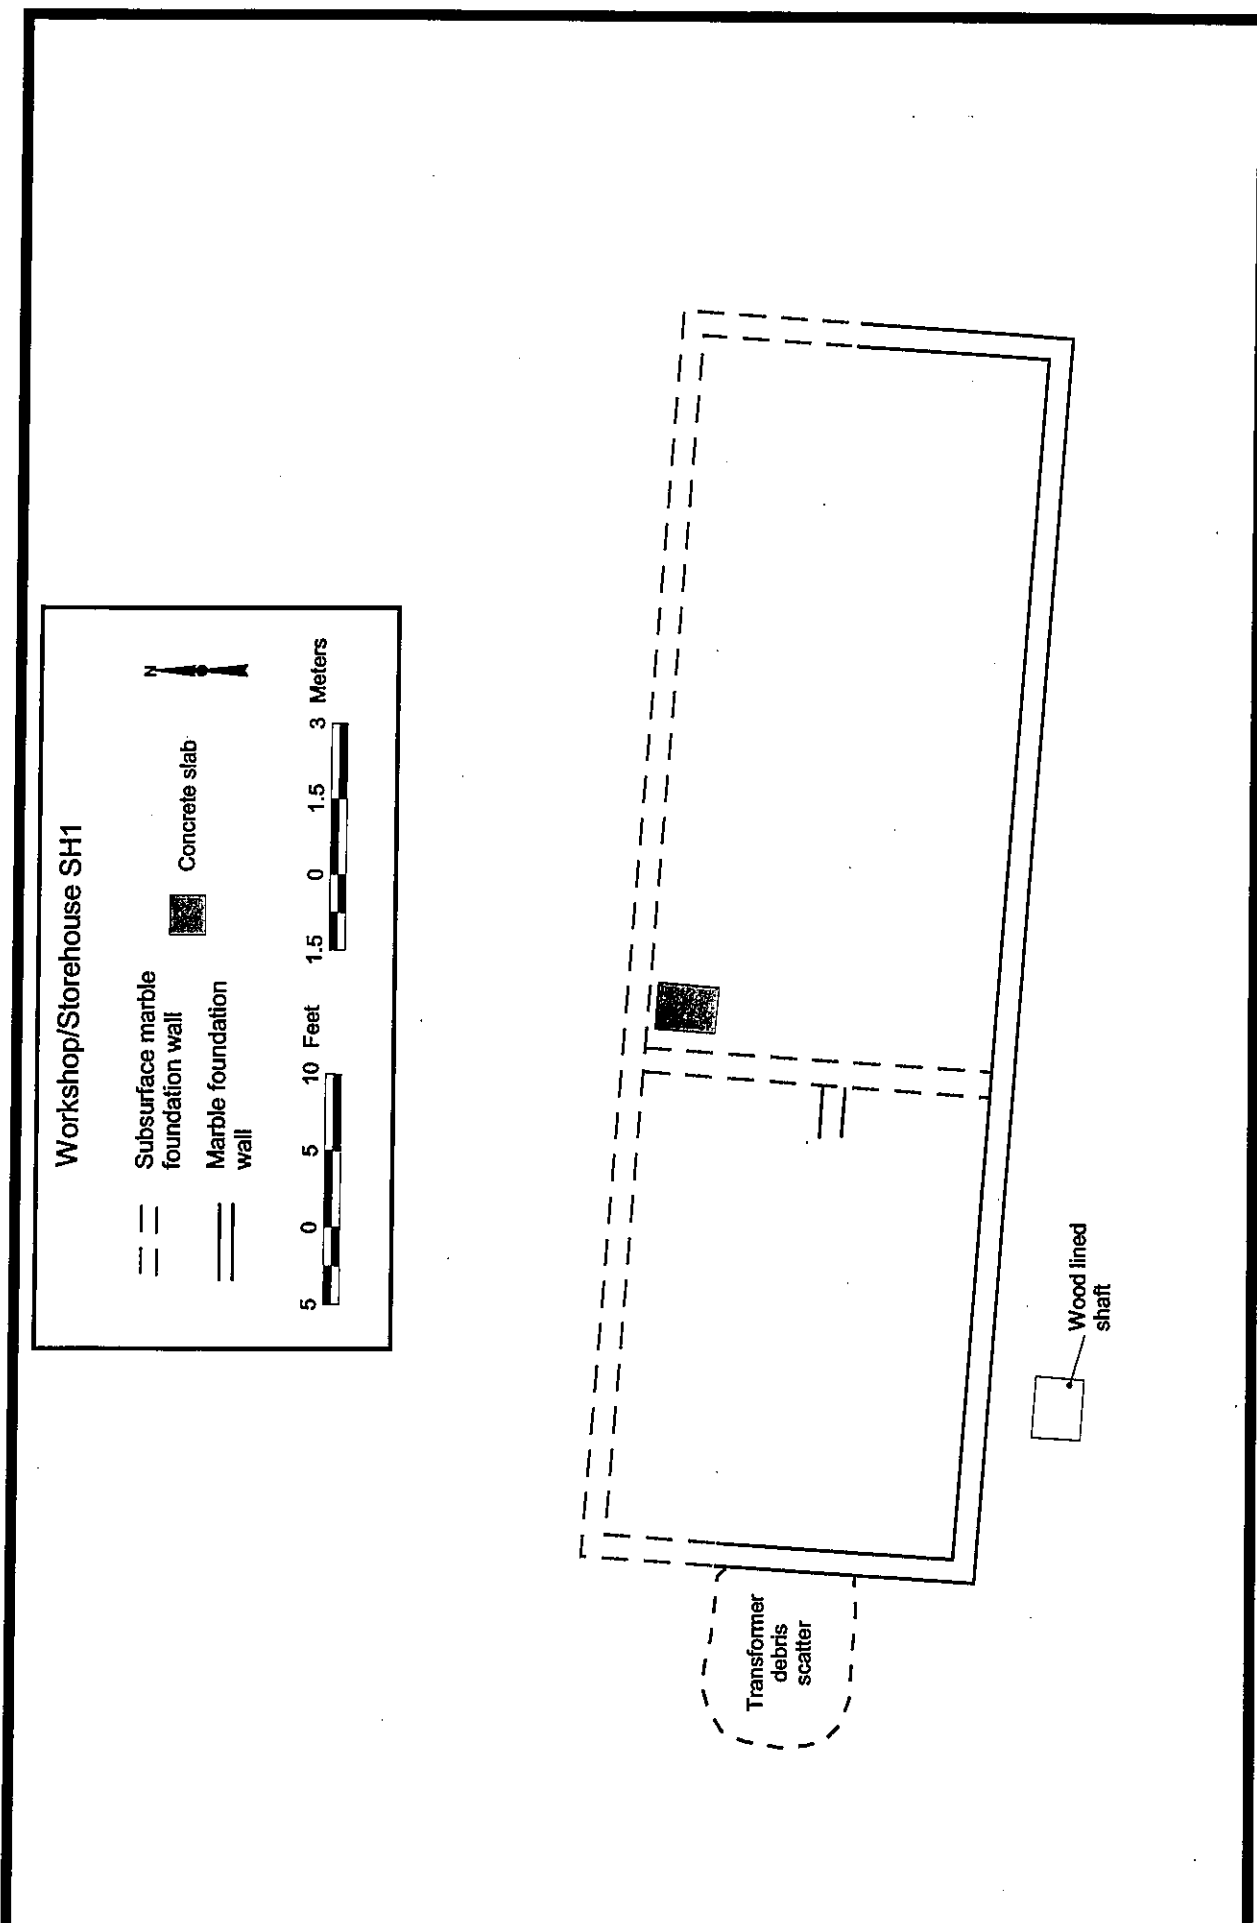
Plan view drawing of ancillary structure SH1 foundation remains.
